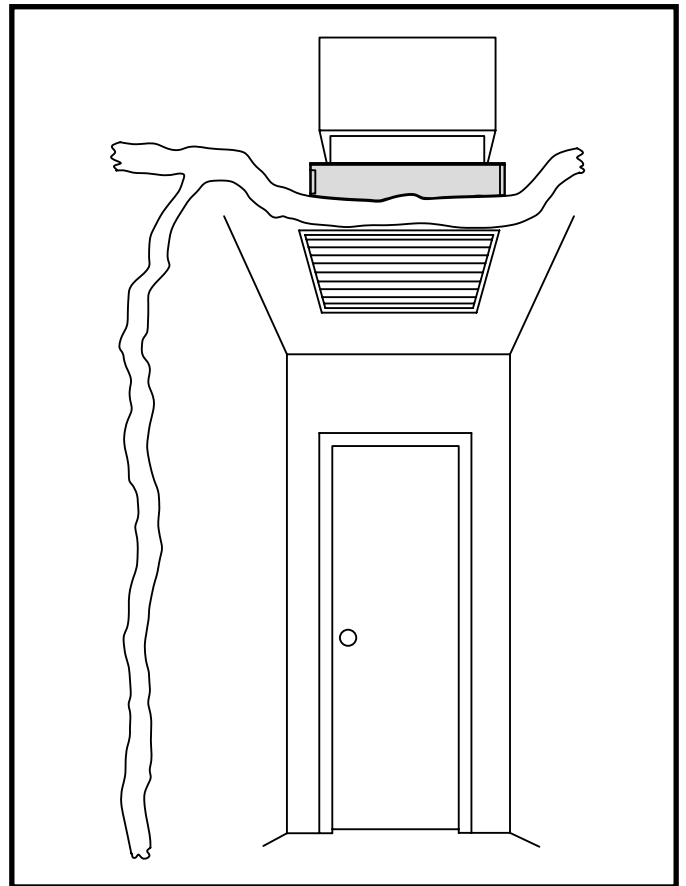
Central fan installation, with media air cleaner mounted horizontally in central return duct.
